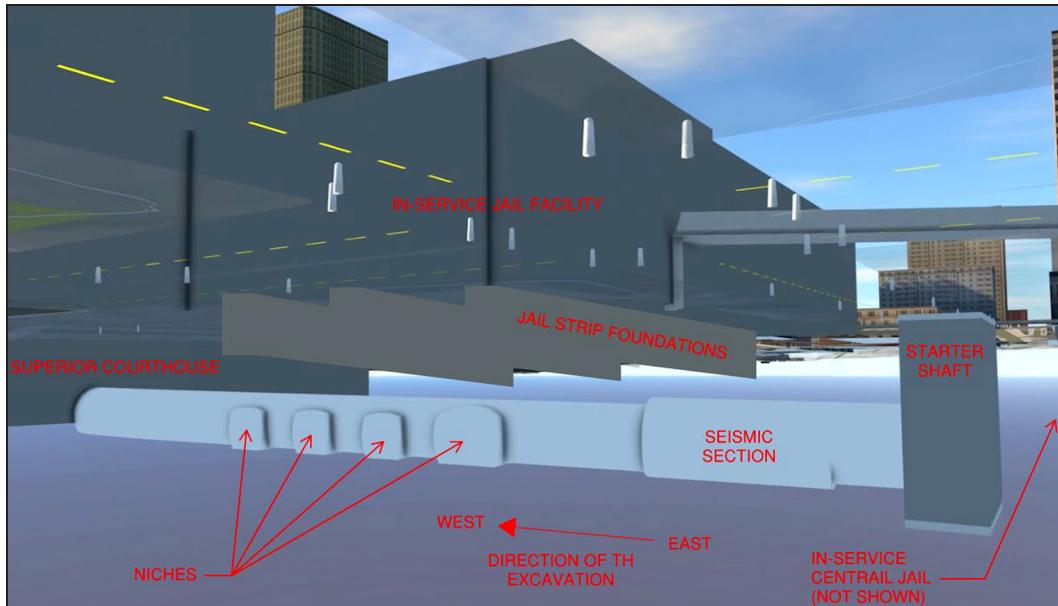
Three-dimensional schematic of tunnel alignment from starter shaft to superior courthouse
